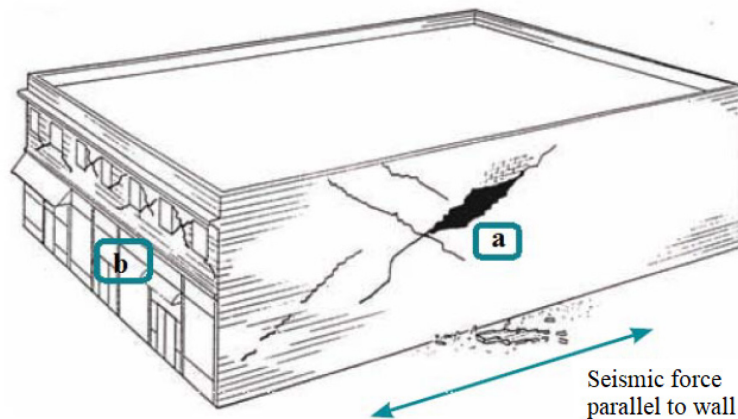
Collapse of the building due to seismic loads (Source: Guri, 2016)
